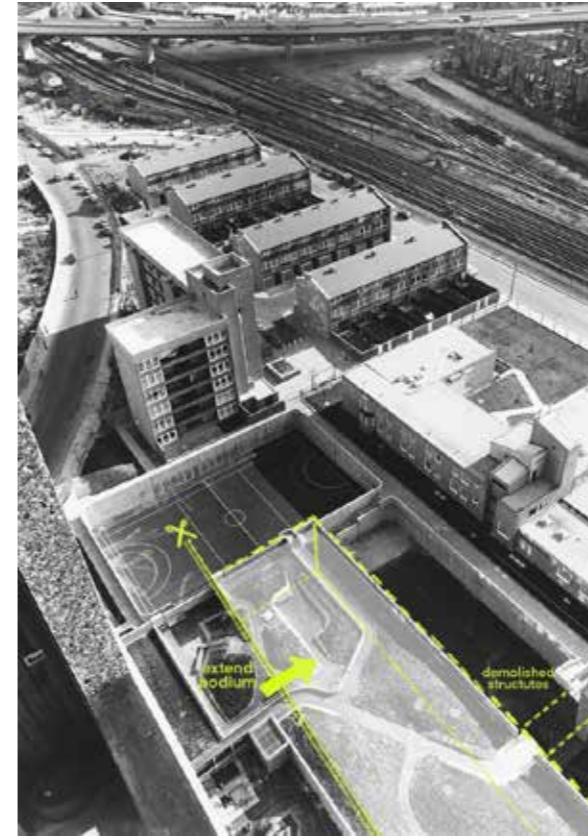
Diagram of the proposed extension of the podium. Original image: Cheltenham estate, Edenham Street, North Kensington, London: view from the Trellick Tower of the low-rise blocks and terraced housing below. Date: 1972. Source: Architectural Press Archive / RIBA Collections
